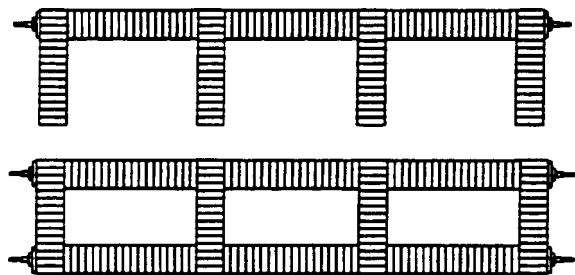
End View Cross-Sections of a Stress-Laminated T-Beam Bridge (top) and a Stress-Laminated Box-Beam Bridge (bottom)
